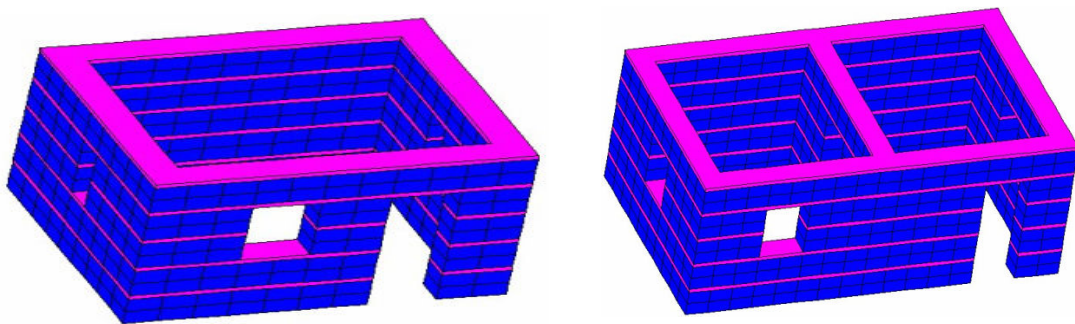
Model houses (single room-left and two room - right) with wood bond beam
